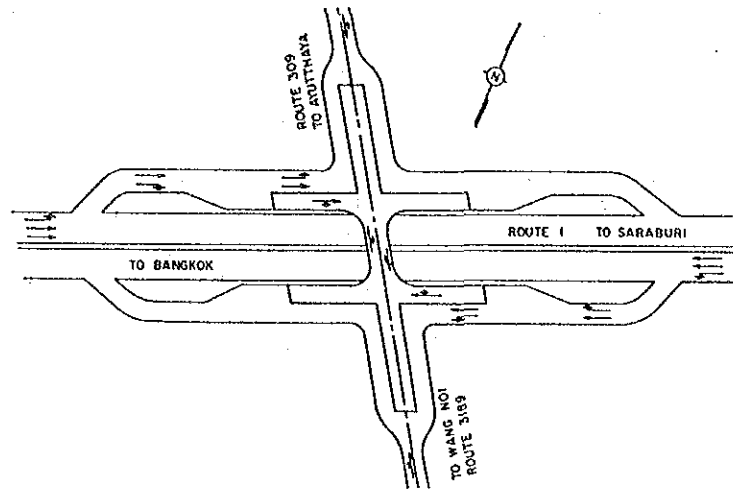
Grade Separation Plan at Wang Noi Intersection
